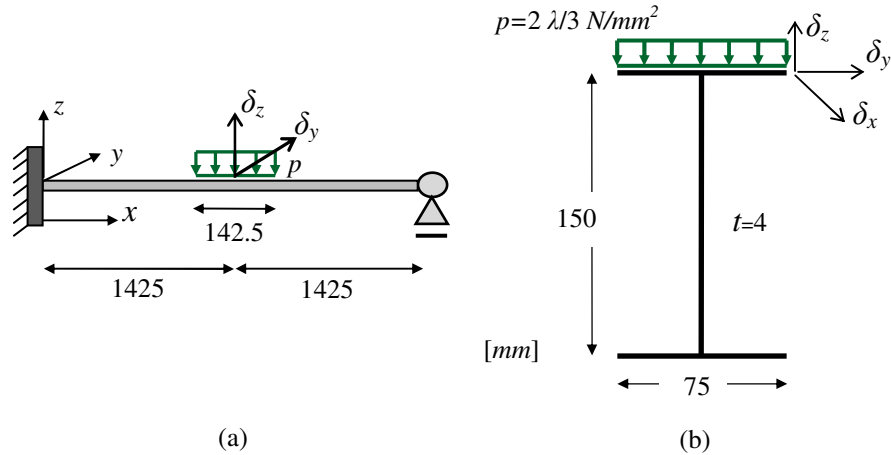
Fixed-pinned I-section beam (a) overall view and loading, and (b) cross-section dimensions.
